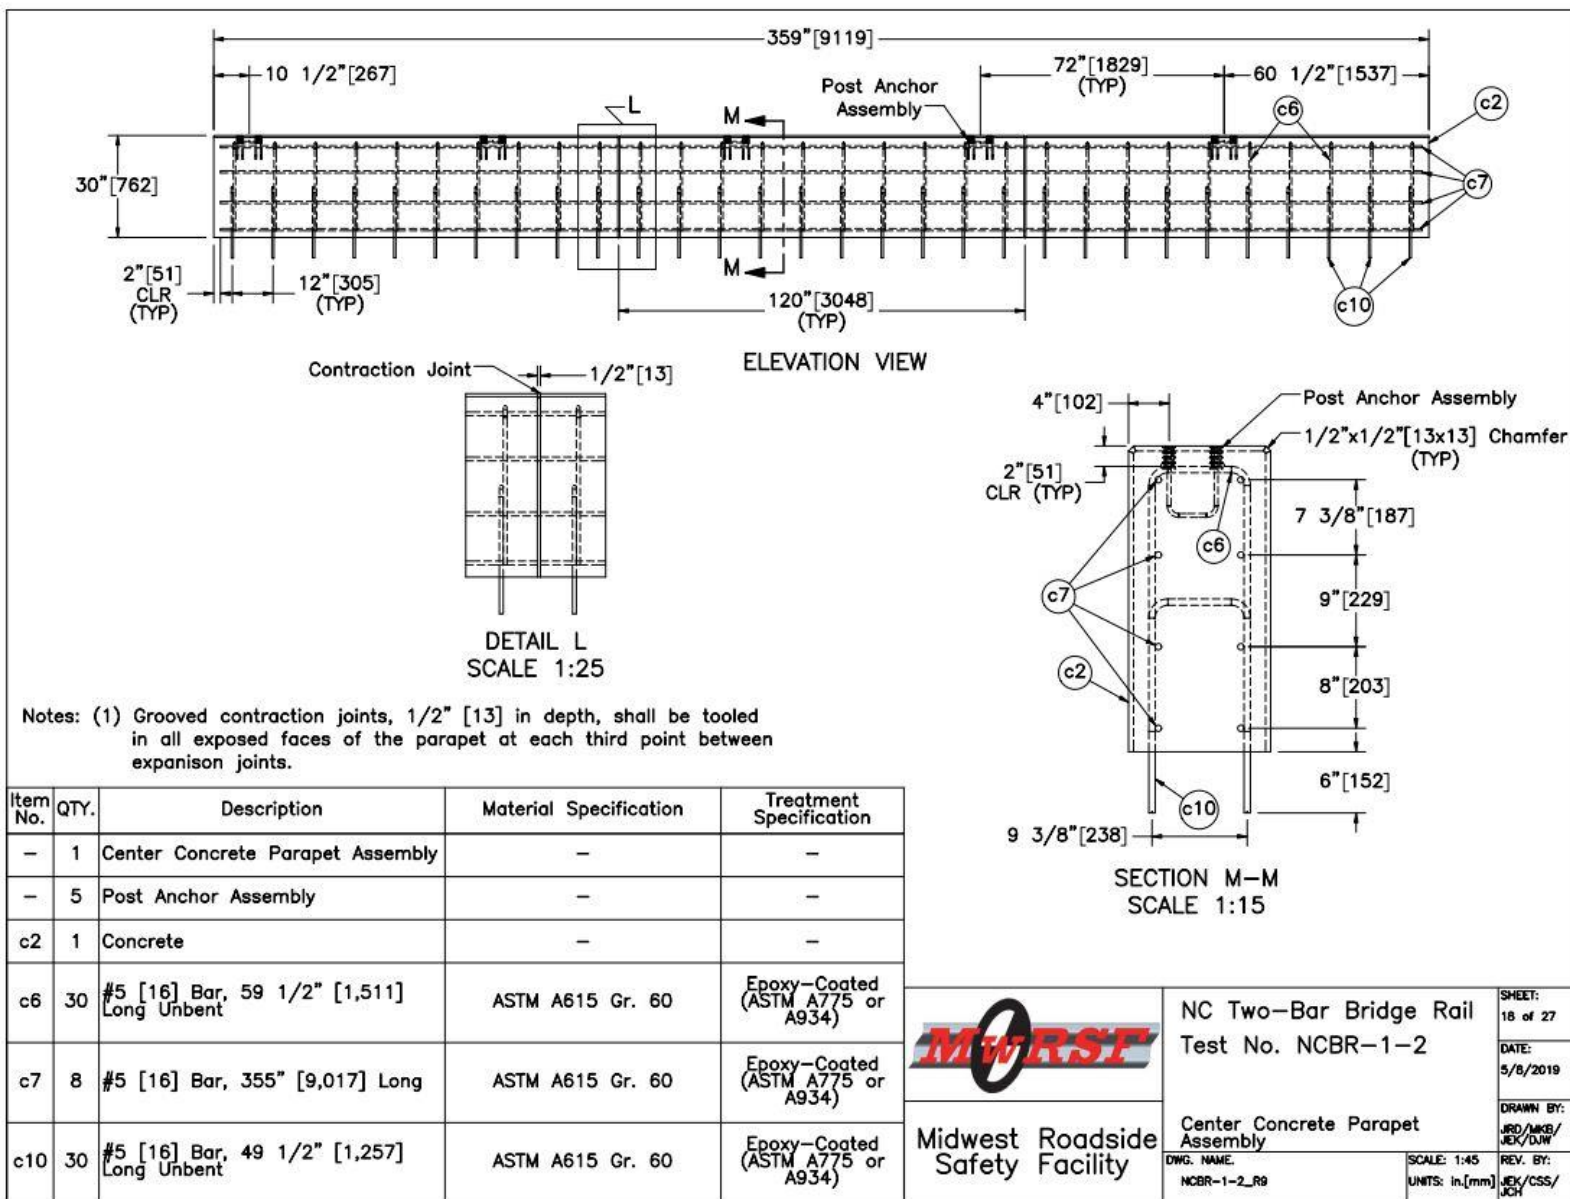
Center Concrete Parapet Assembly, Test Nos. NCBR-1 and NCBR-2
